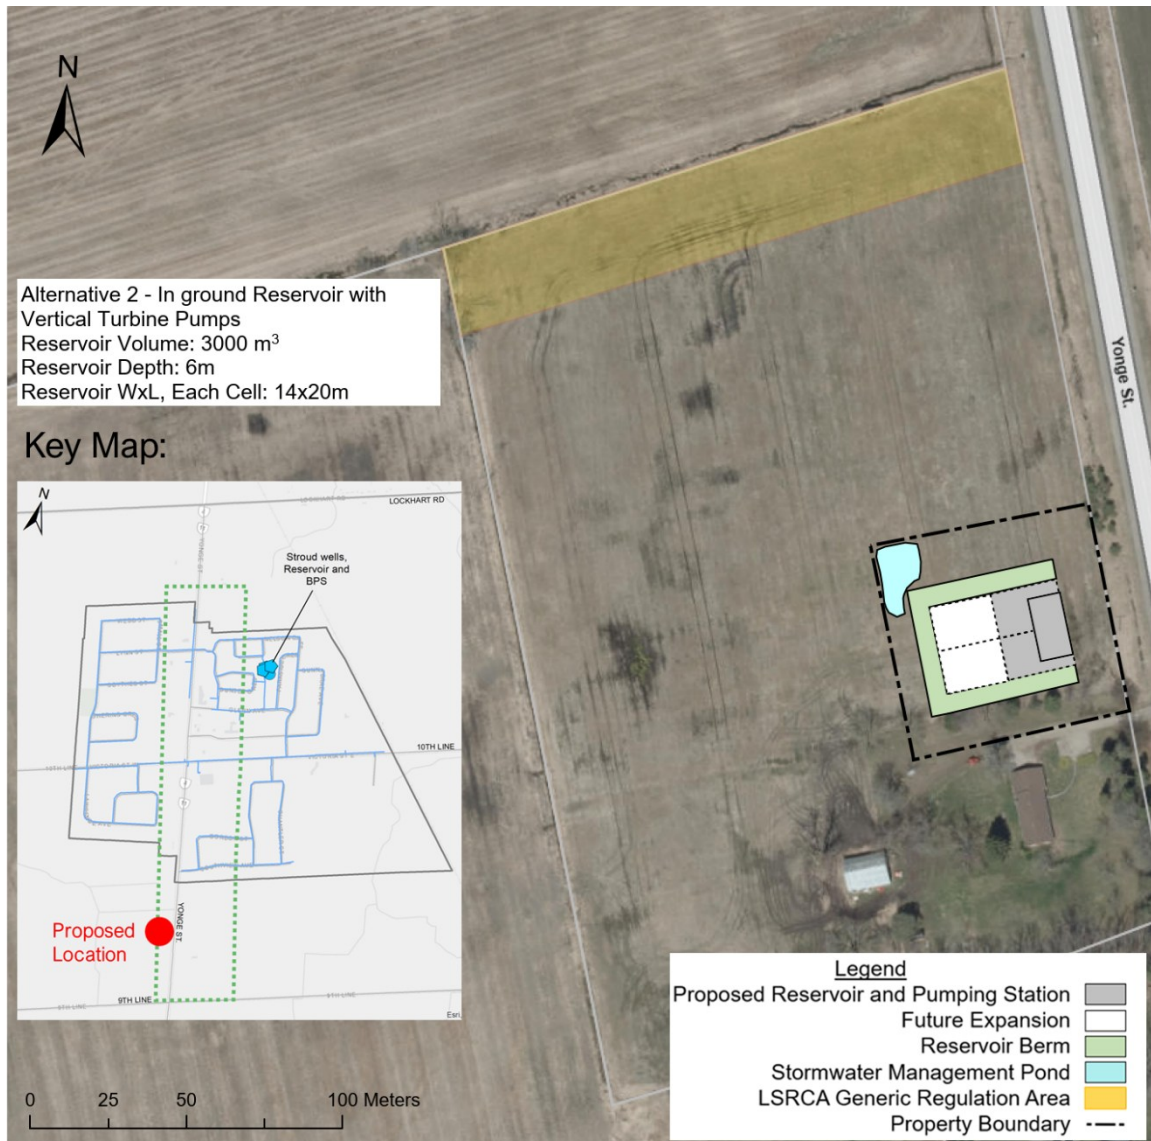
Conceptual Site Layout of Preferred Alternative – At Location 2 with In-Ground Reservoir and Booster Pumping Station
